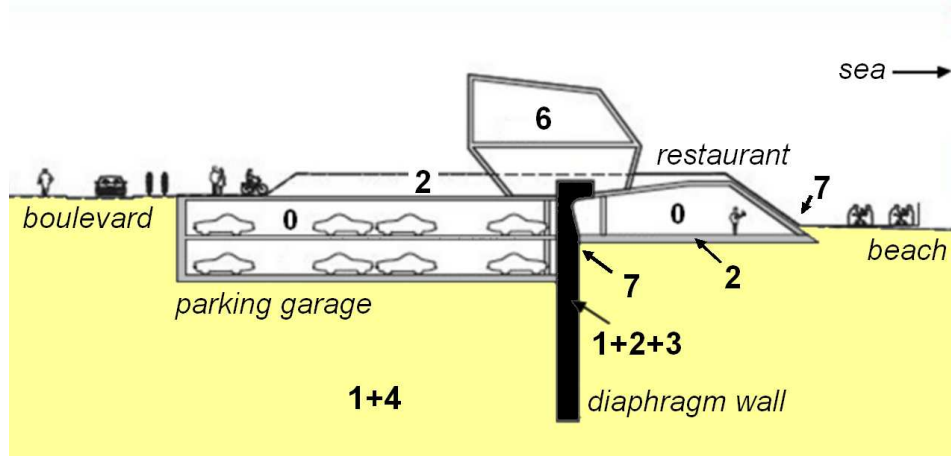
Cross-section of the wall-in-dune alternative for Katwijk, Netherlands
